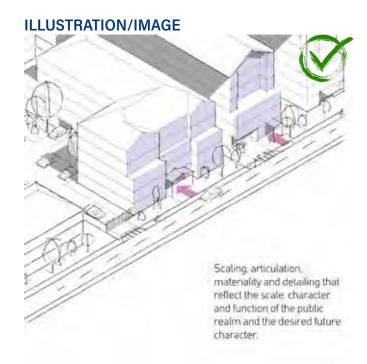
Multiple Dwellings - Facade Design Example Diagram
